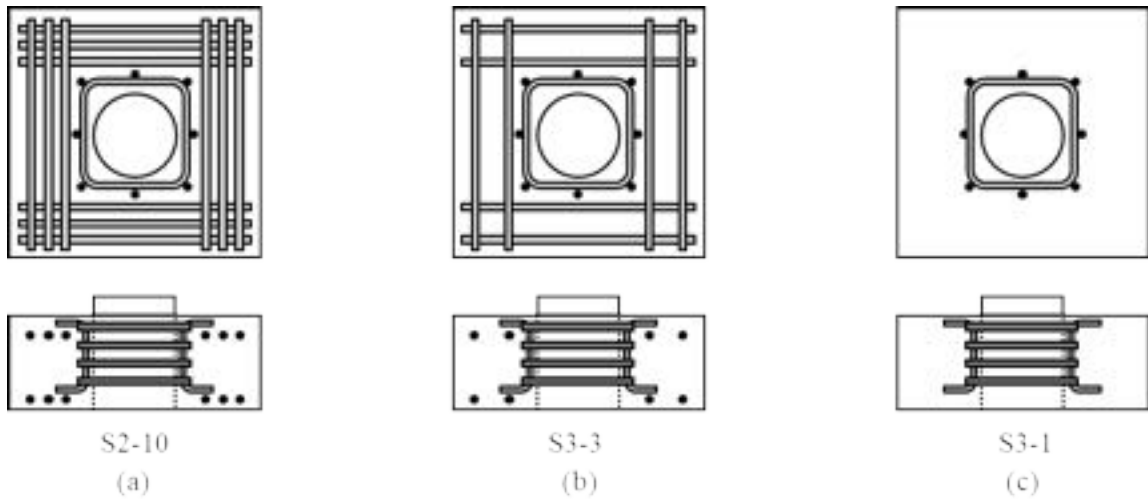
Reinforcement details for longitudinal reinforcement specimens, (a) full longitudinal reinforcement, (b) 2/3 longitudinal reinforcement, and (c) no longitudinal reinforcement
